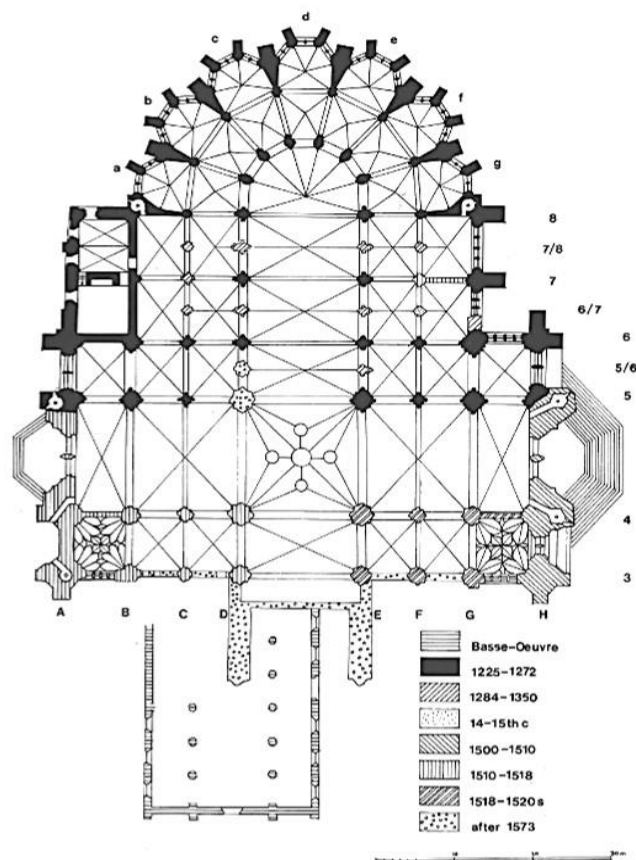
Ground Plan of Beauvais Cathedral Showing the Different Construction Phases and Later Structural Interventions (Murray, 1989).
